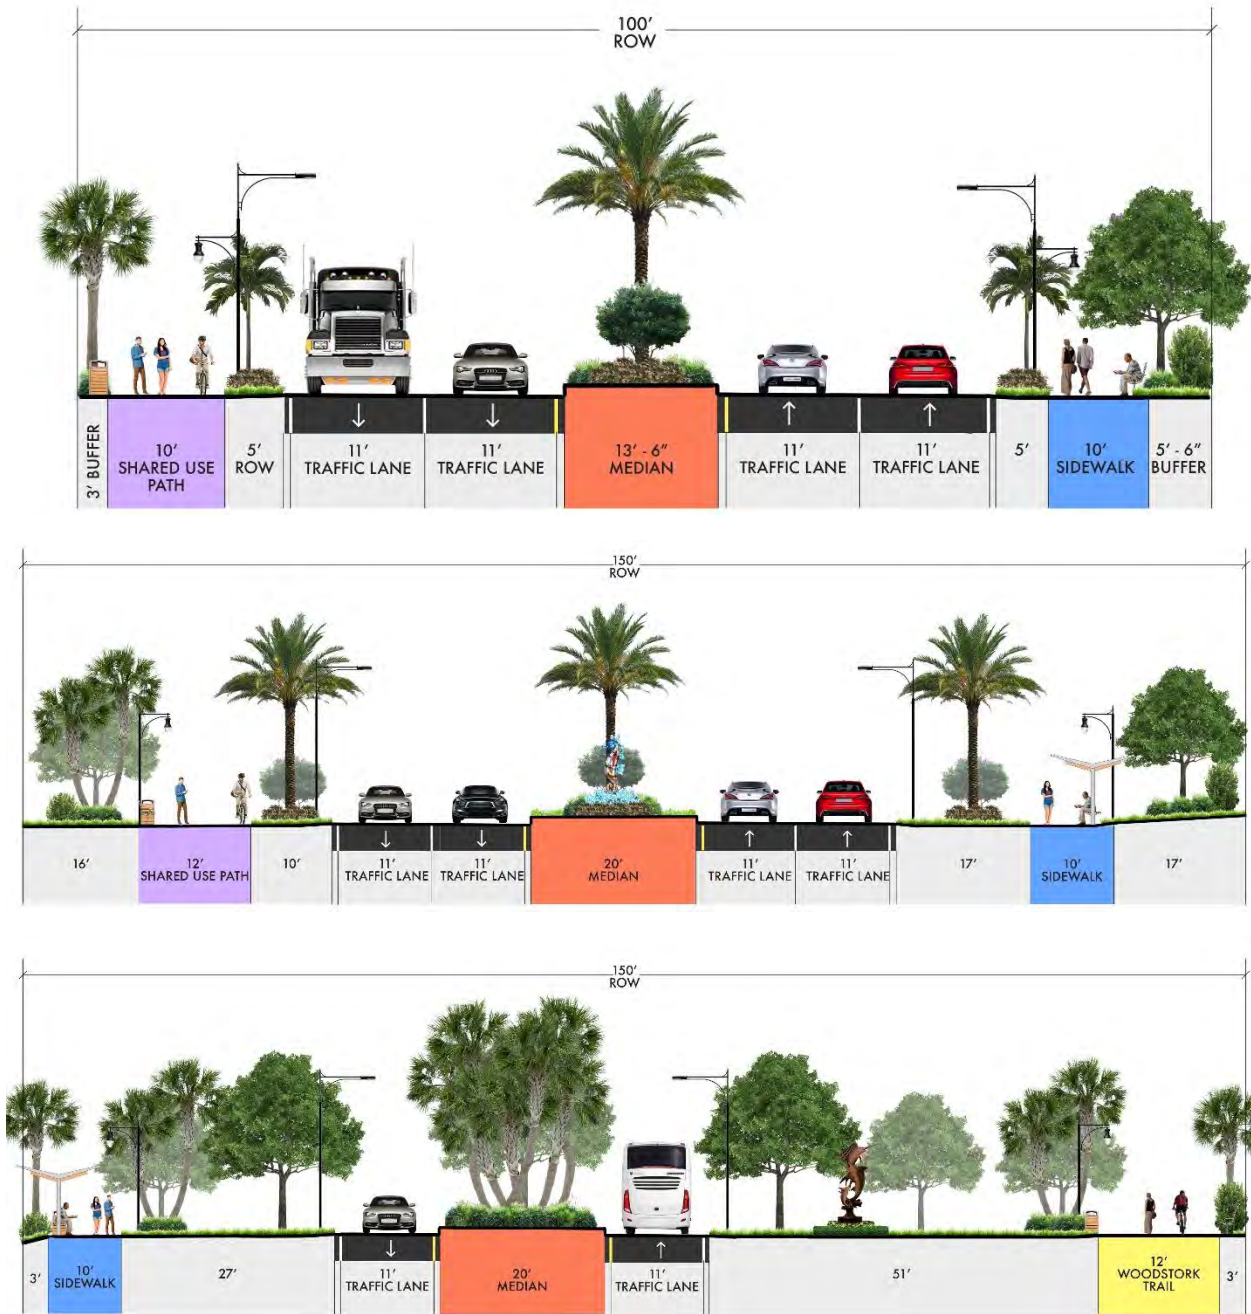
Concept 1 Typical Cross-Section of Village Green Drive
